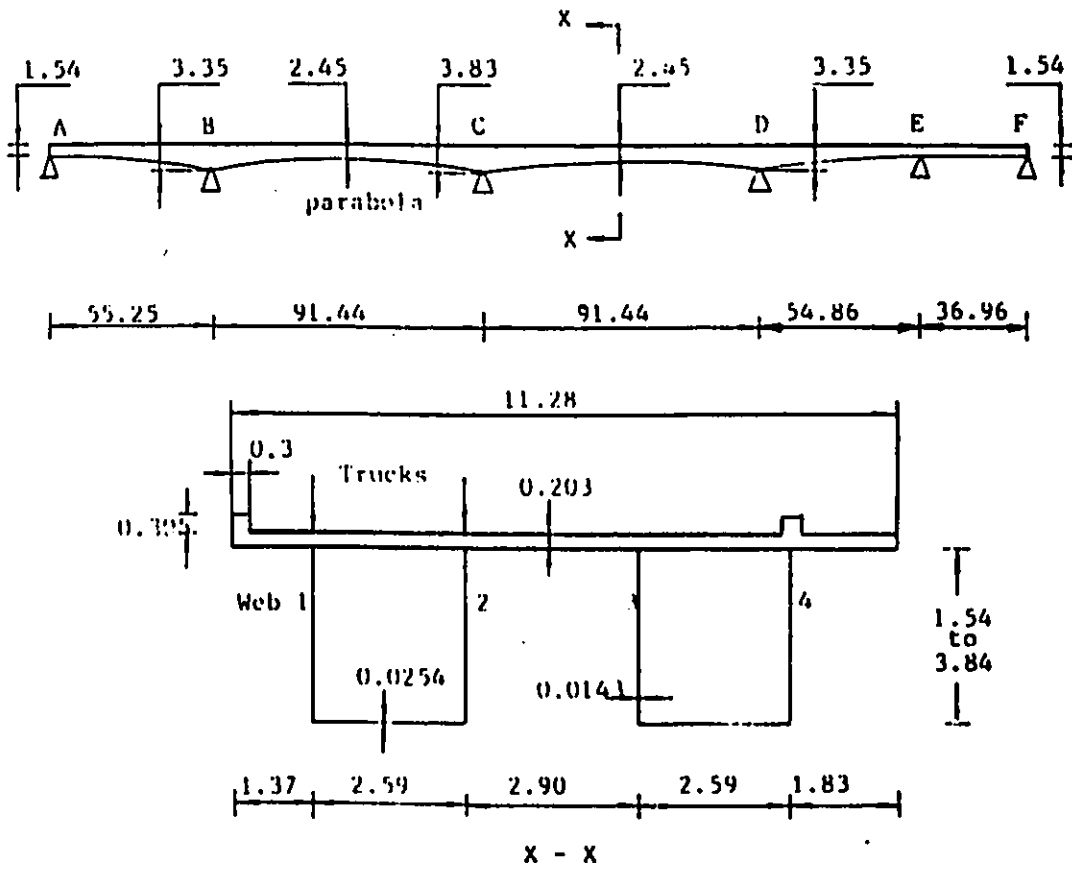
Five Span Composite Box-Girder Bridge (in M)
